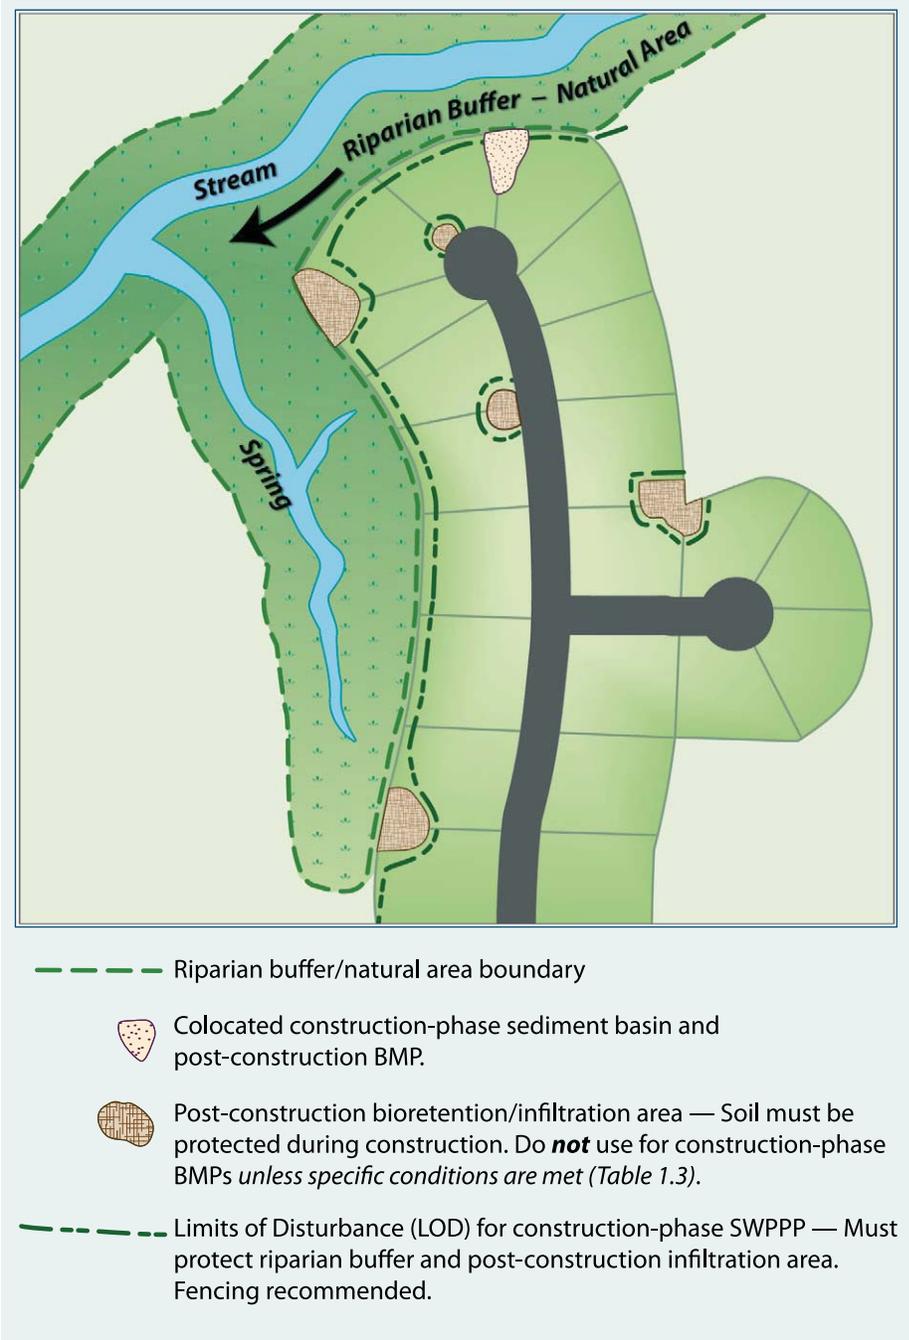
Construction stormwater and post-construction stormwater plans must be coordinated to protect post-construction design features and BMPs
